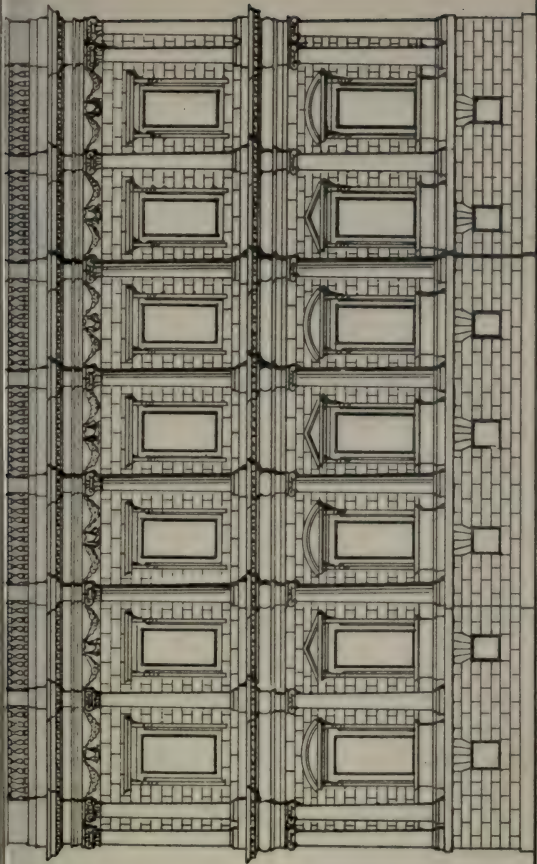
THE BANQUETING HOUSE, WHITEHALL PALACE
